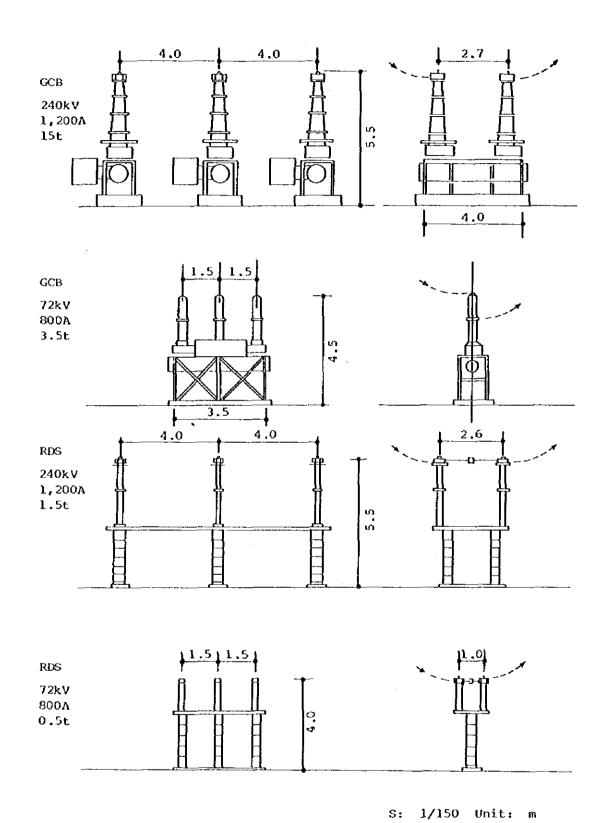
Main Facility Externals of the Substation (1/2)
